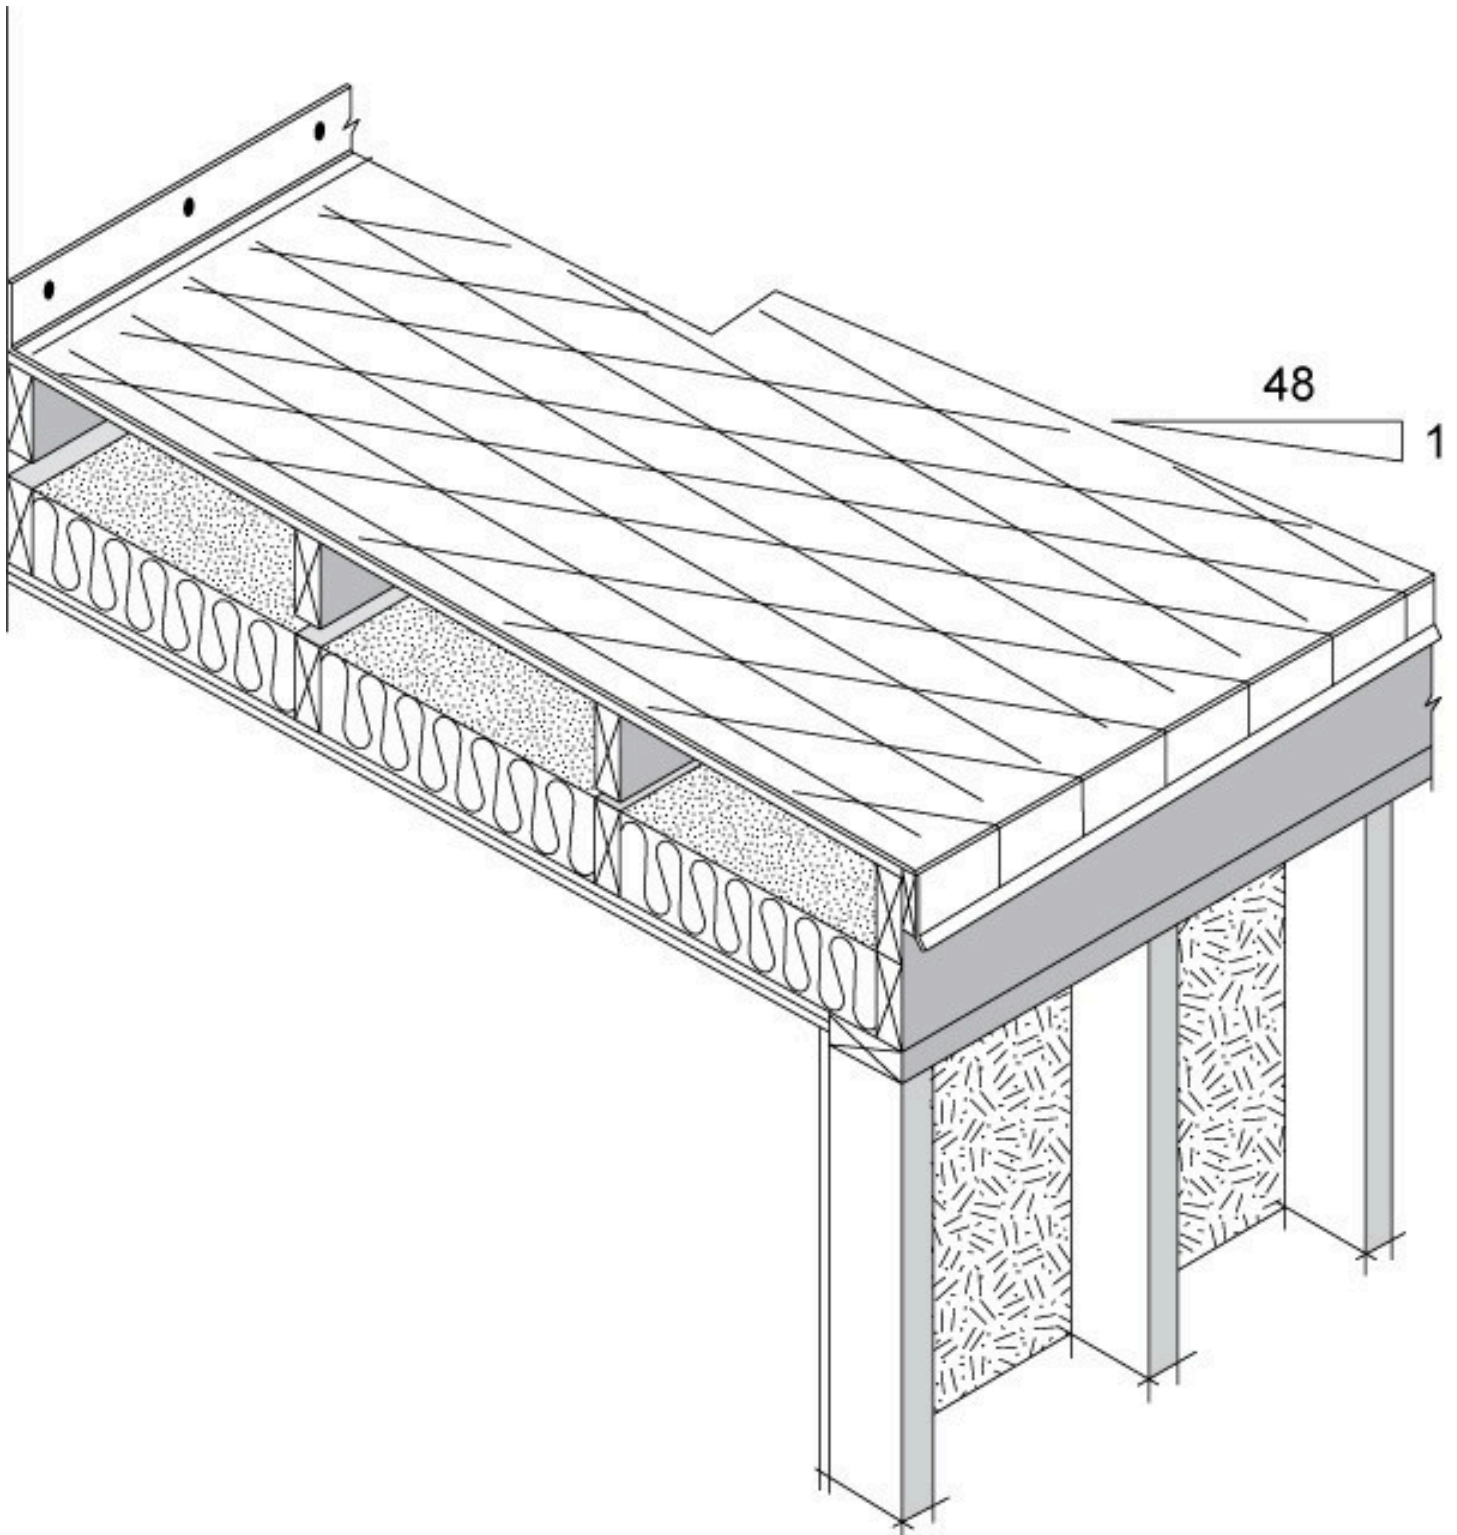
Typical roof/deck application for “DekSmart™ Ultra”
